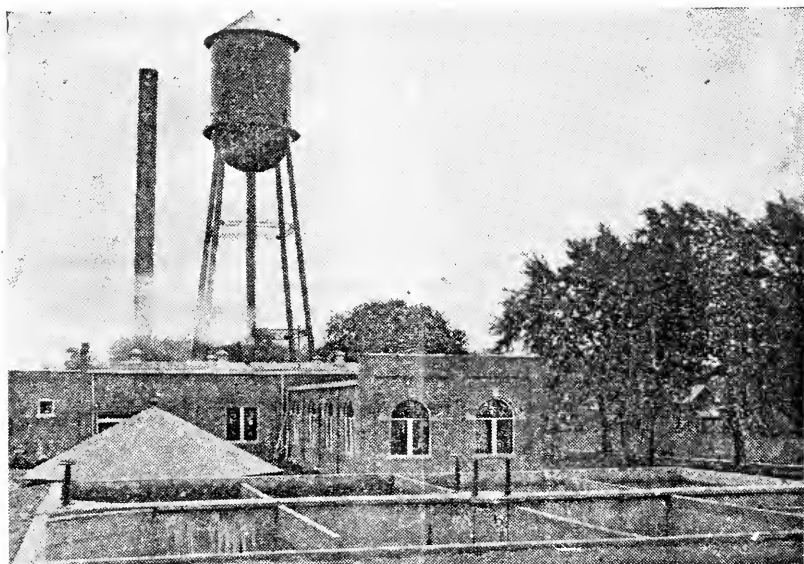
Water purification plant showing settling basins in the foreground, filter house, and elevated pressure and storage tank in the background.
